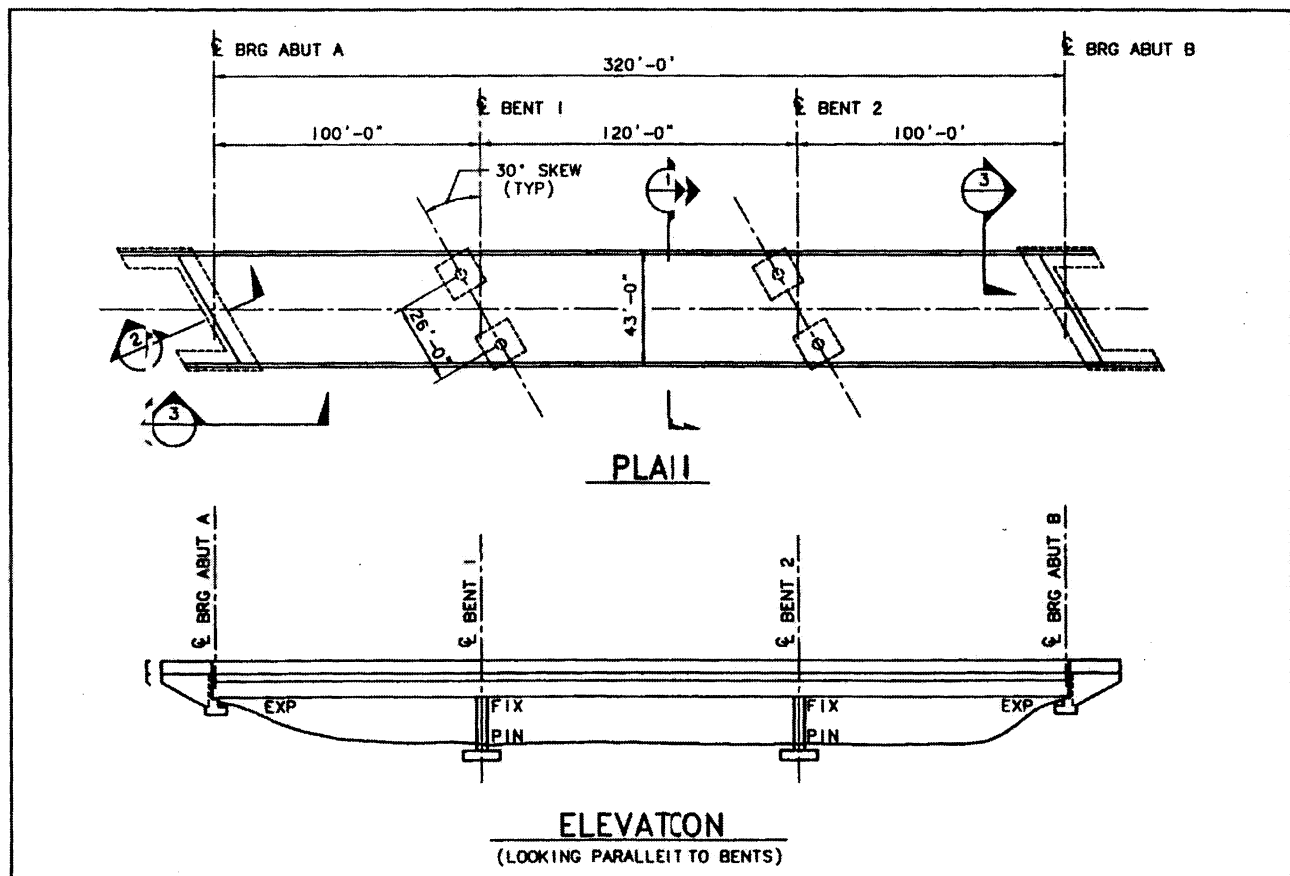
Bridge No. 4 – Plan and Elevation
